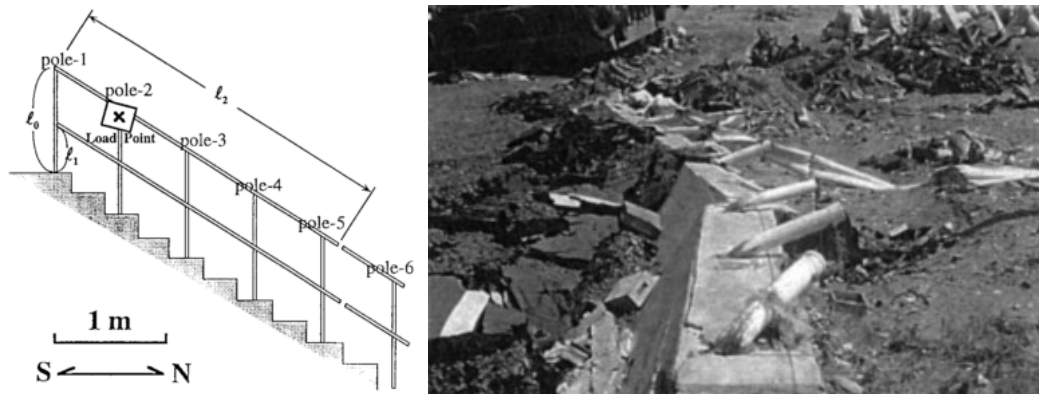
Schematic and photograph of guardrail damaged during the Hokkaido Tsunami (Tsutsumi et al., 2000)
